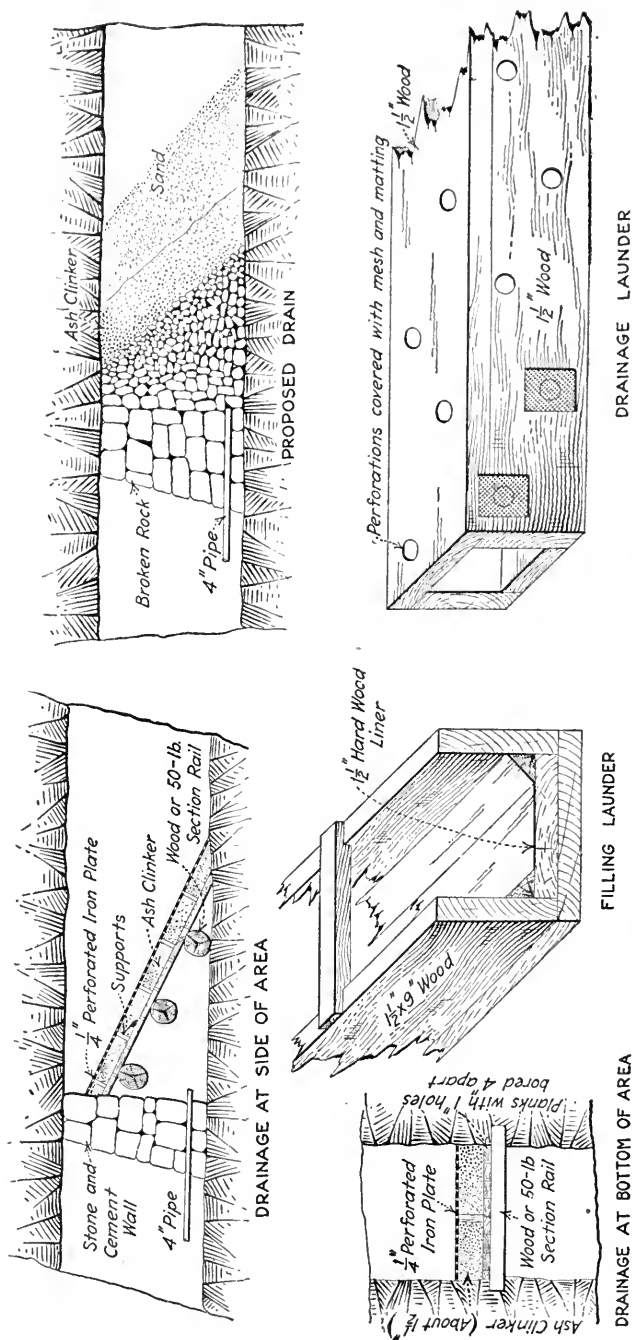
DETAILS OF UNDERGROUND LAUNDERS AND BULKHEADS.
